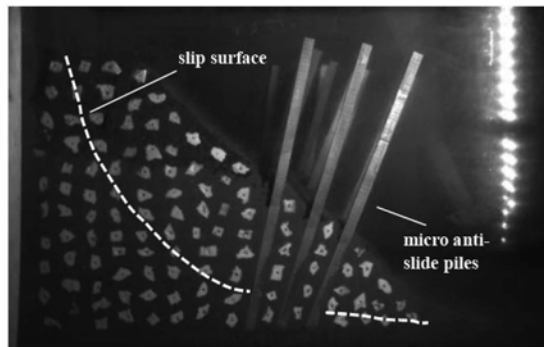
Photograph of the slope reinforced with sparse piles after failure.
